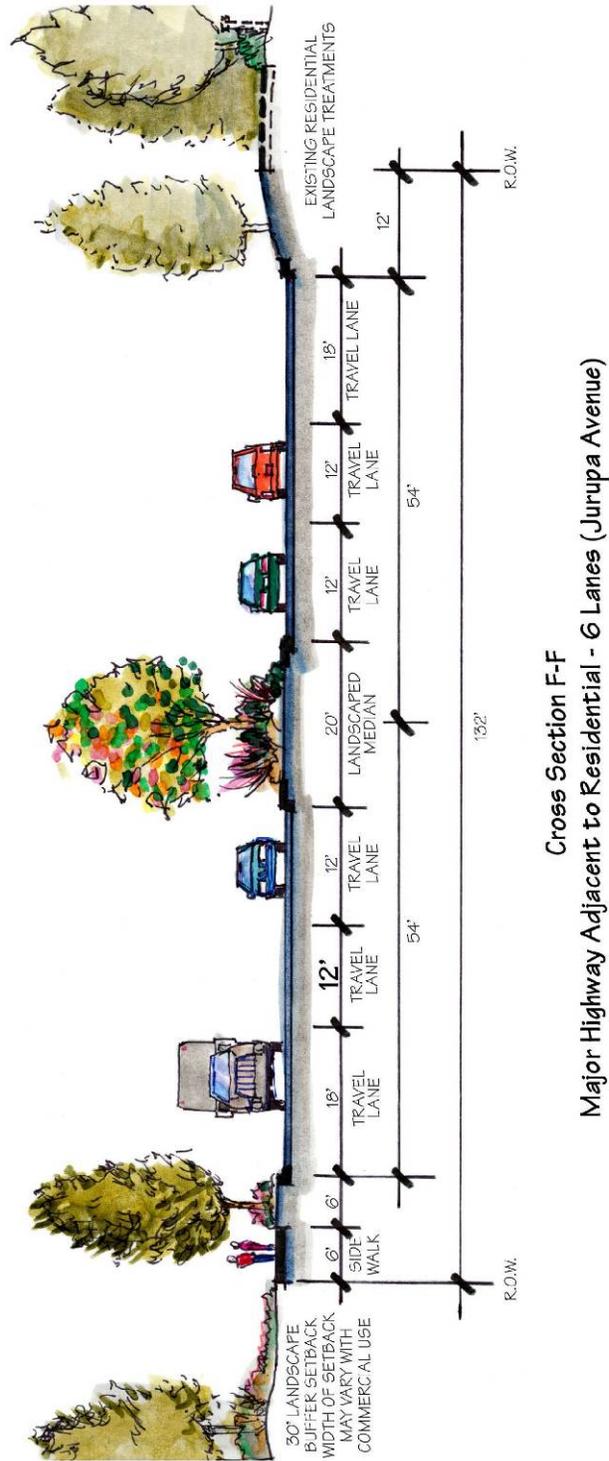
Major Highway Adjacent to Residential – 6 Lanes – Cross-Section F-F (Jurupa Avenue)
